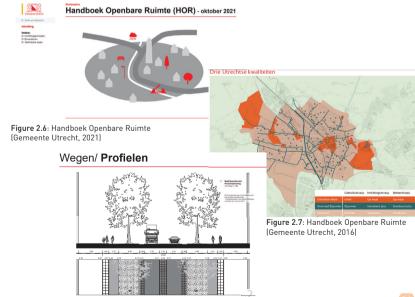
Handbook Openbare Ruimte (Gemeente Utrecht, 2021)
